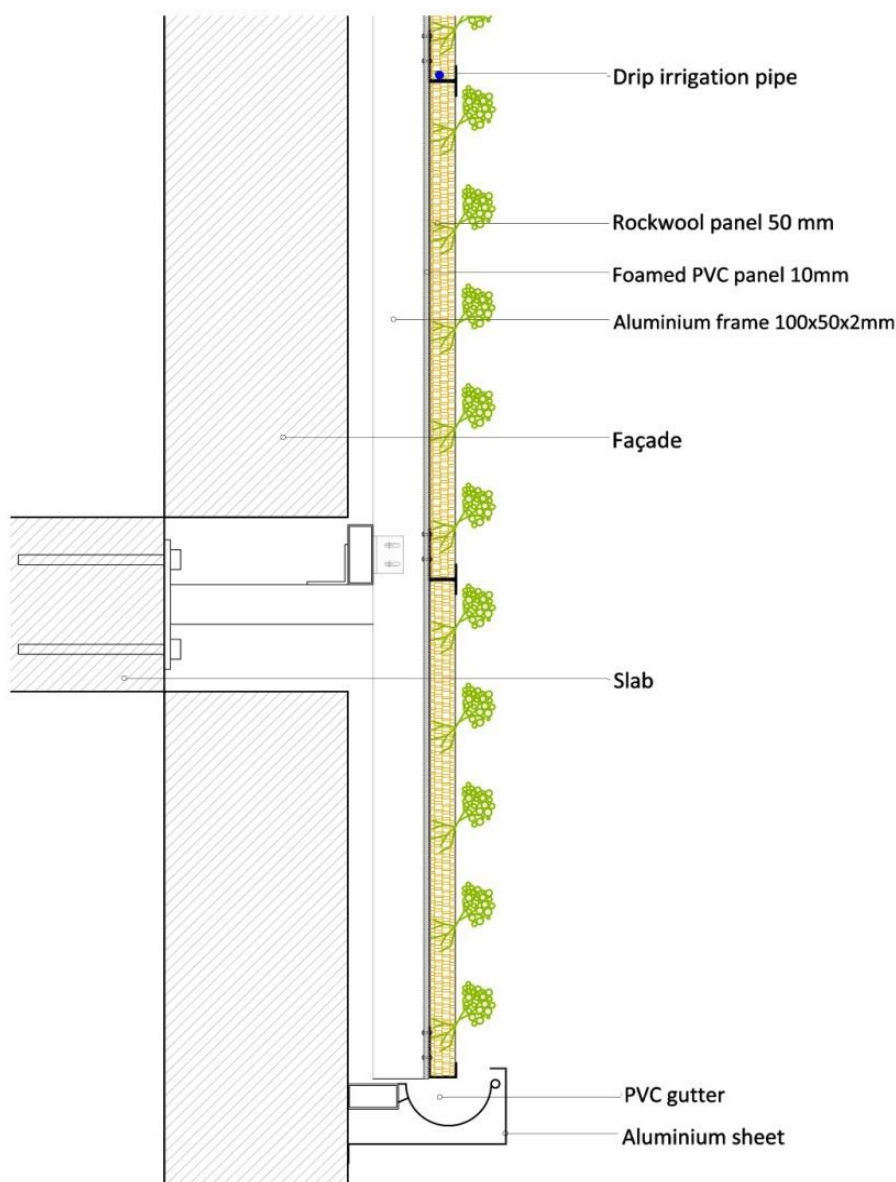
Constructive section of the vertical garden - Green façade in the Corte Inglés (Source: SingularGreen).
